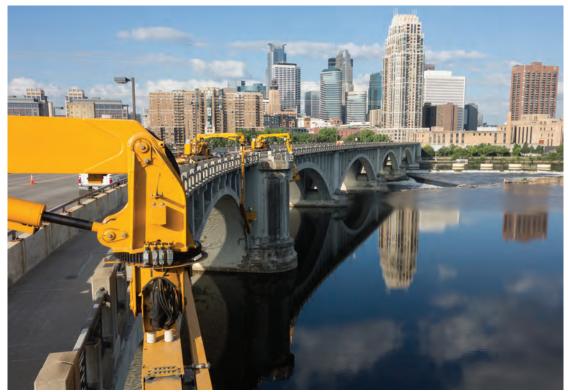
Engineers utilizing three under bridge inspection units for close-up bridge inspection and sounding during the Phase 1 bridge inspection (photograph by WJE).
